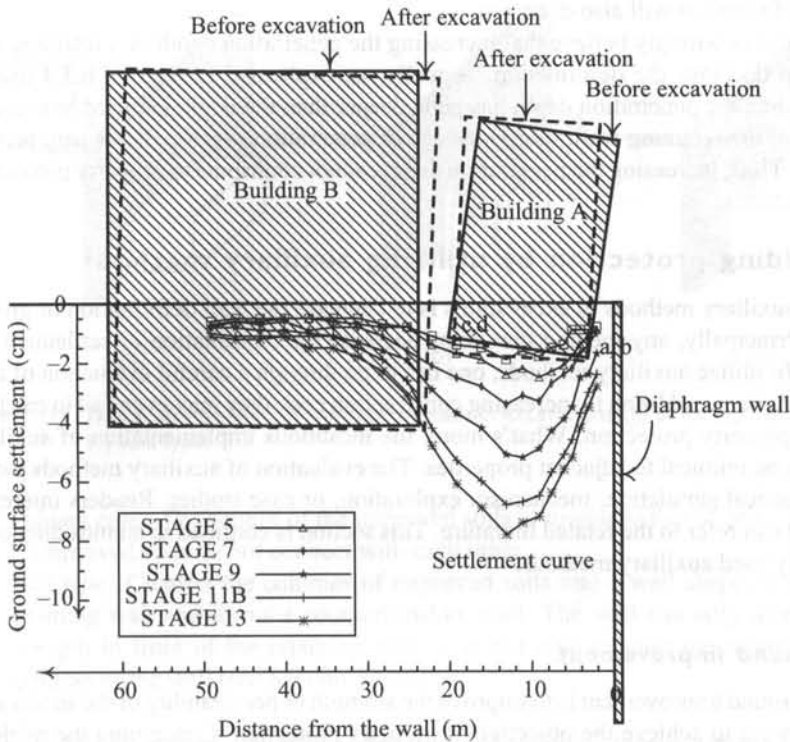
Slanting conditions of the buildings after excavation for the TNEC excavation.
